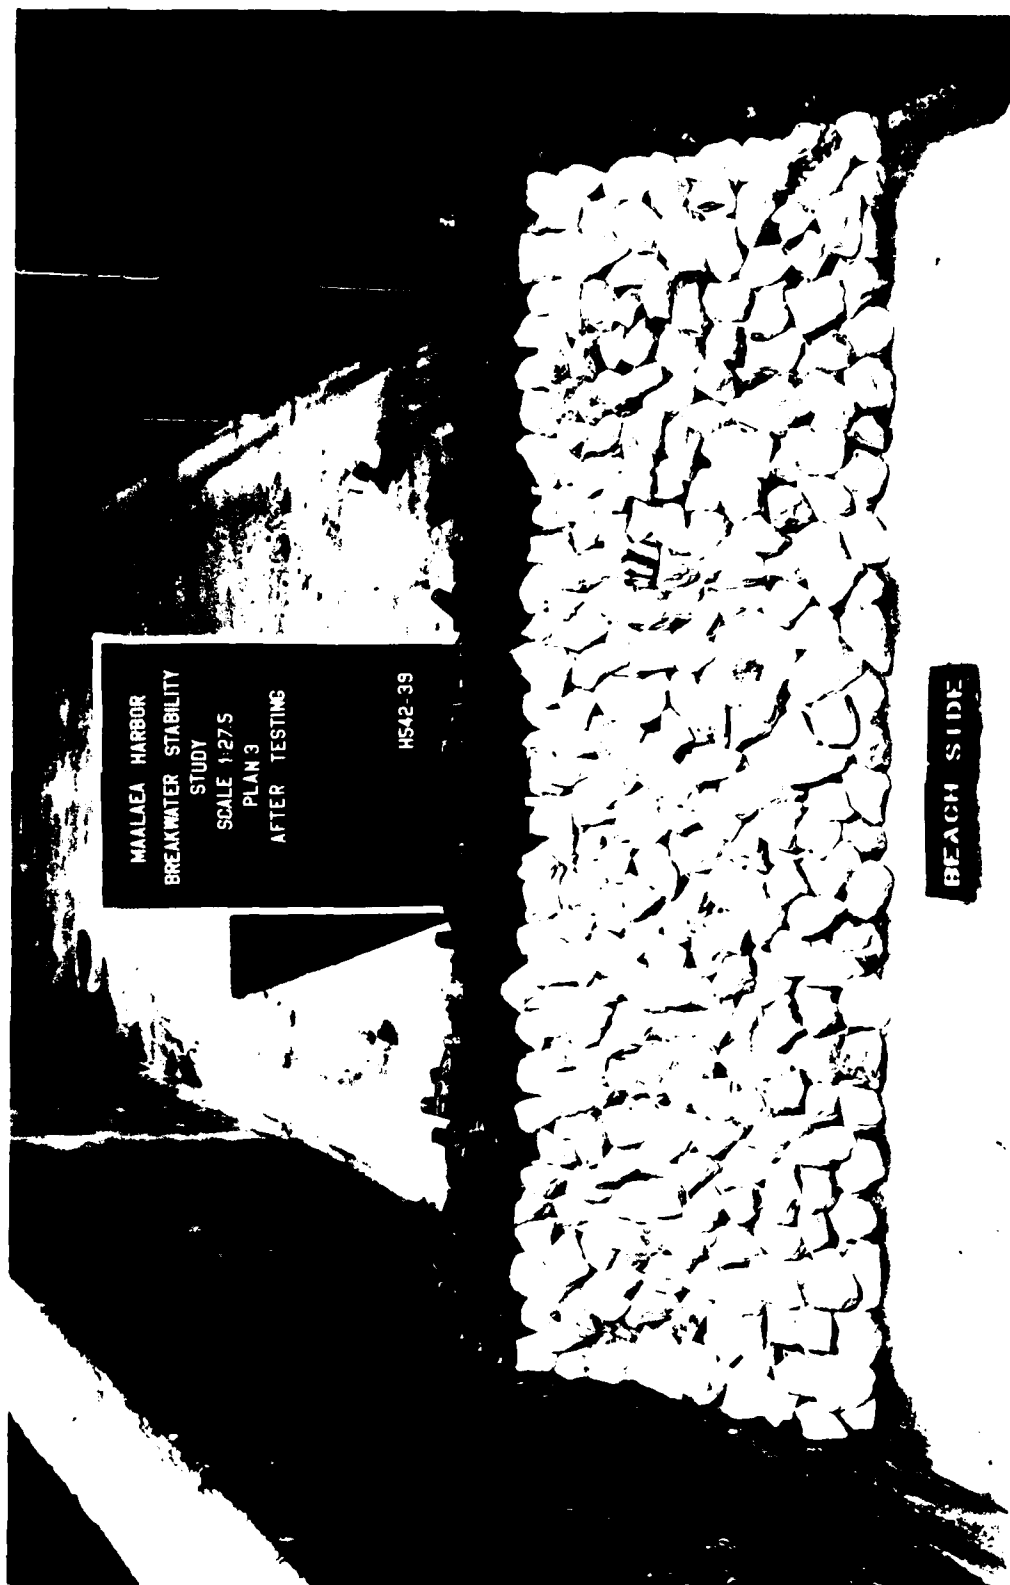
Beach-side view of Plan 3 after attack of 16-sec, 16.7-ft breaking waves at an SWL of +3 ft, 111w
